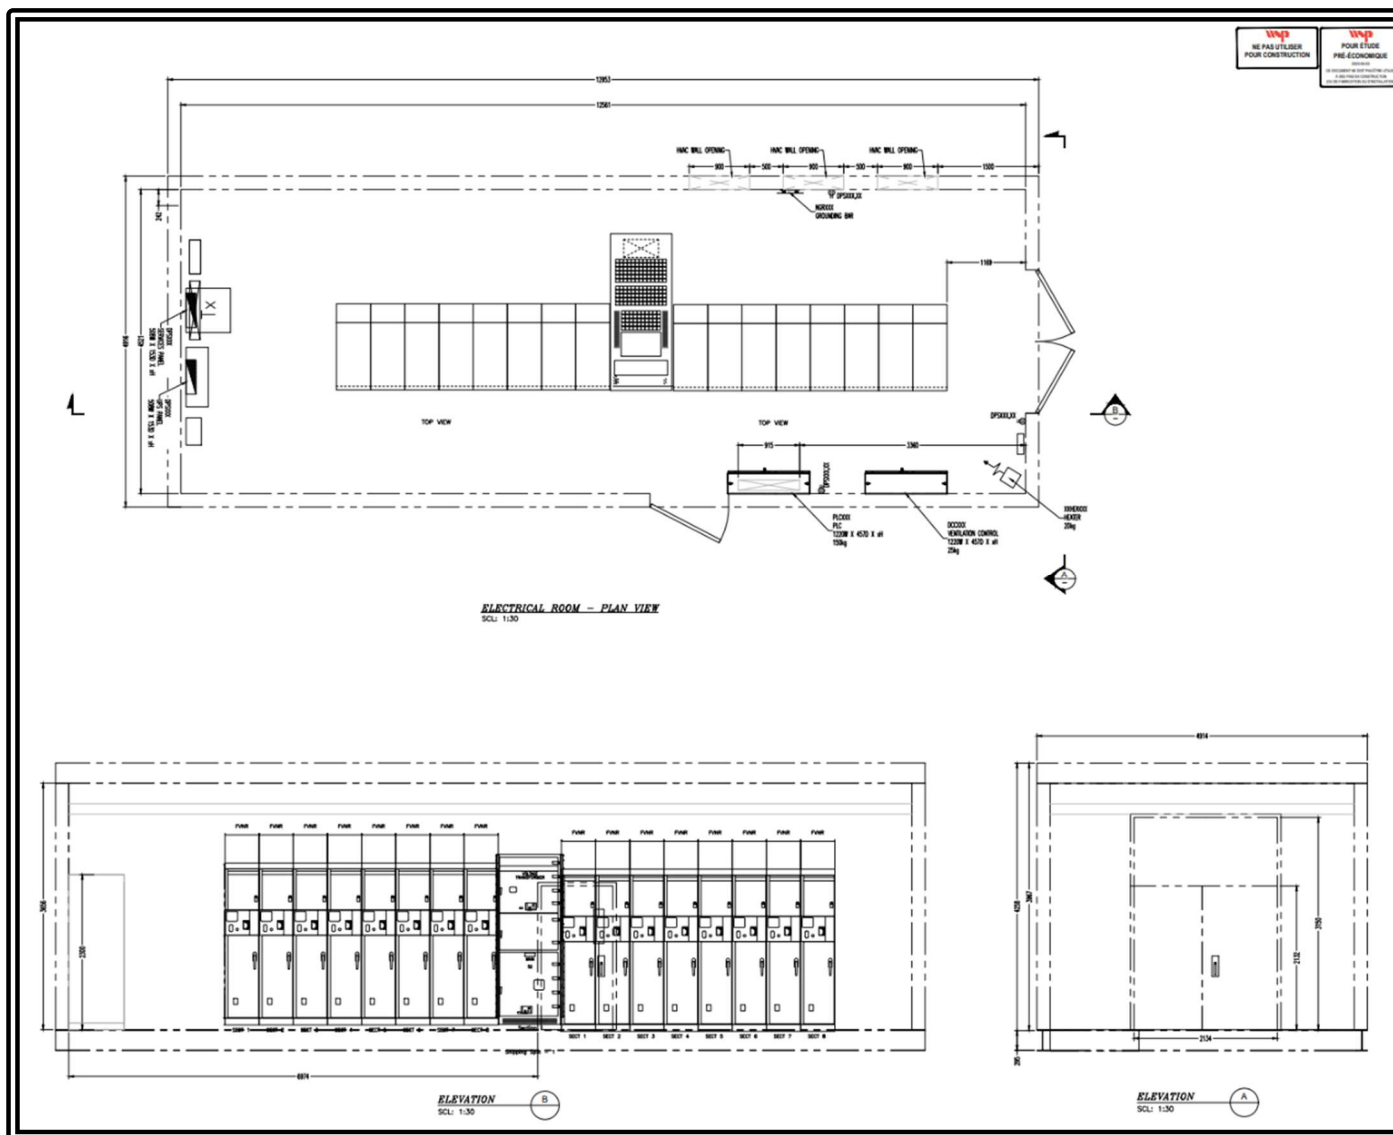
Option 2 GA – Drawing # 0000-E001-0202-0A
